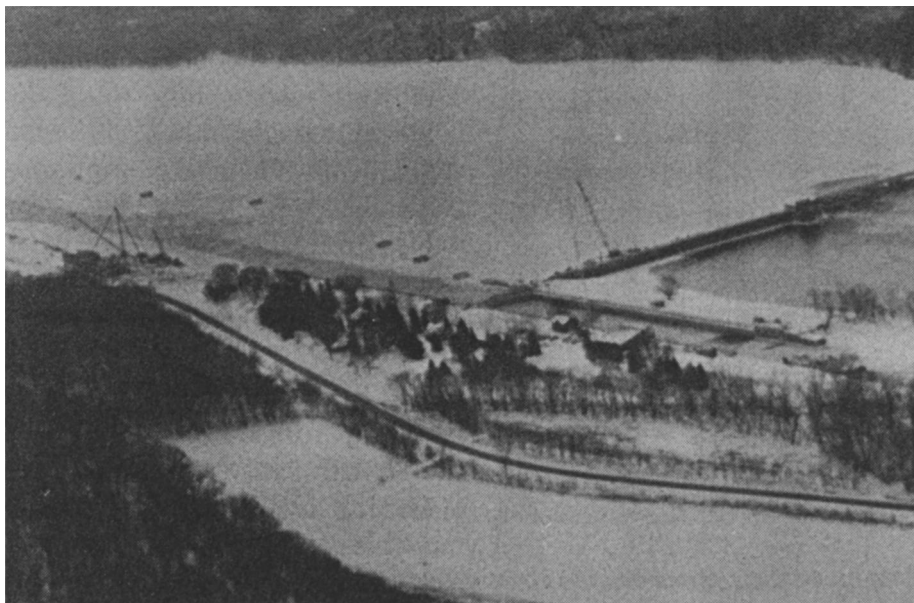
Cylindrical sheet piling mooring cells upstream of a navigation dam can help to stabilize the ice cover in winter.
